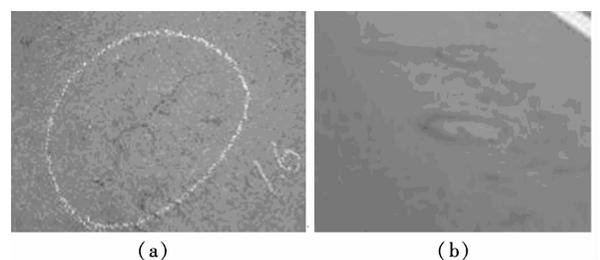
Bubble and ring cracks in epoxy asphalt pavement on SNYRB. (a) Bubble crack; (b) Ring cracks
